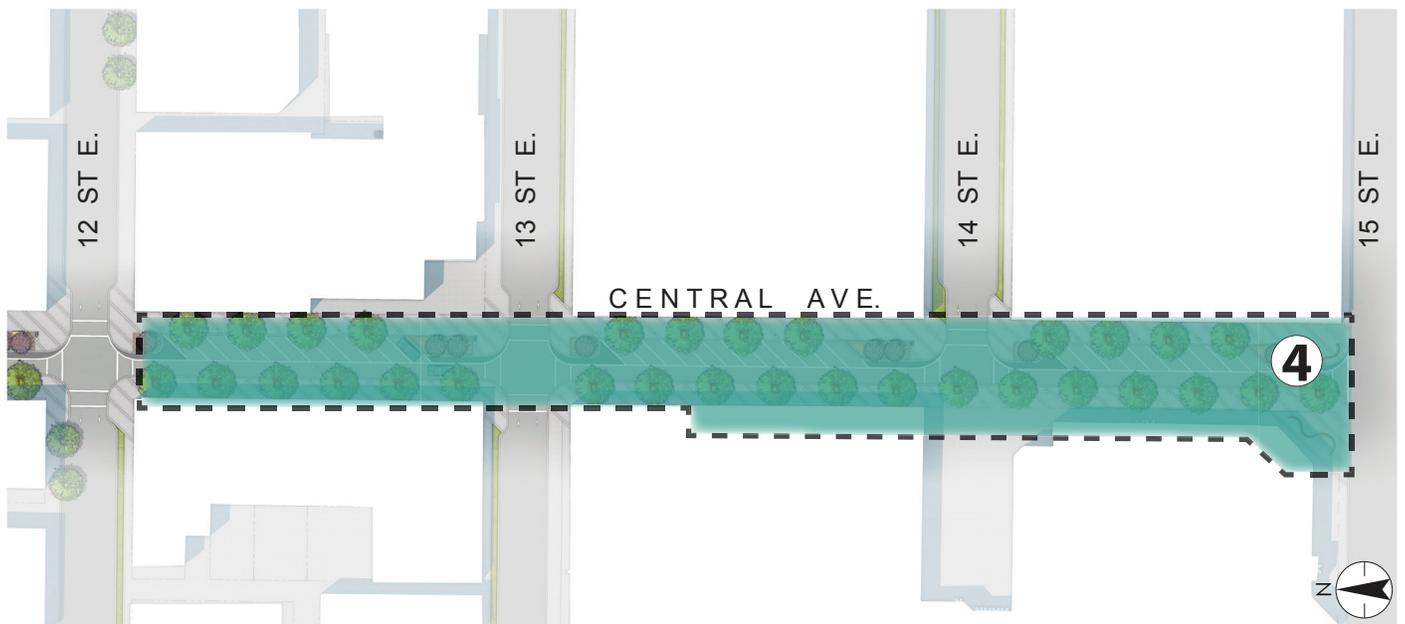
Central Avenue Construction Phase 3 Plan
